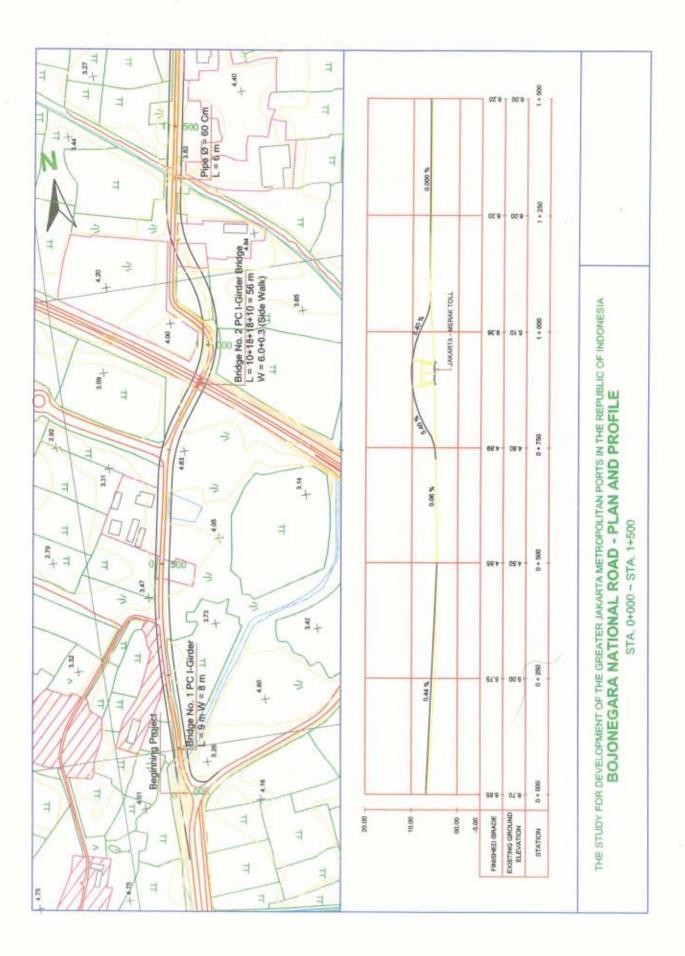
C-11 Bojonegara National Road Plan and Profile (6)
